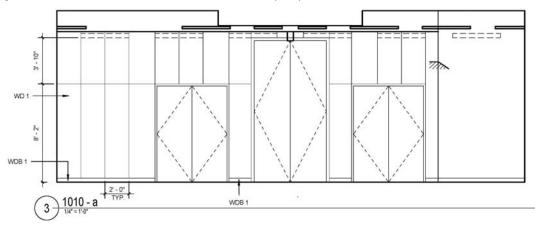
Auditorium Interior Elevation – South Wall (NTS)
